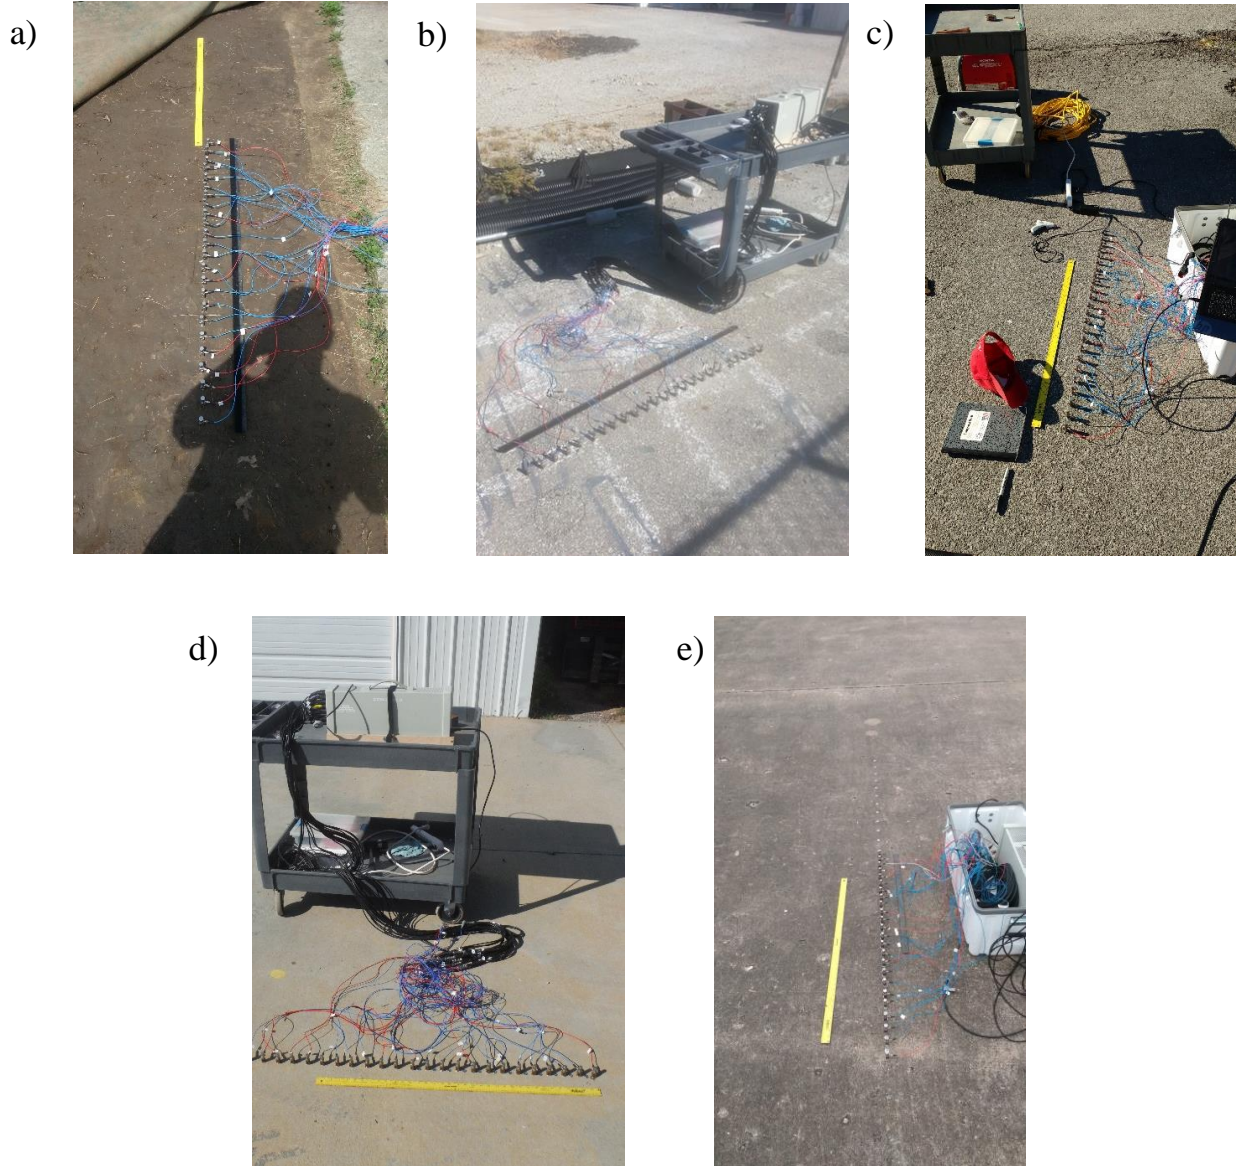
Site pictures of: a) “CTTP Soil”, b) “CTTP Asphalt”, c) “ENRC Asphalt”, d) “ENRC West Concrete”, and e) “ENRC East Concrete.”
